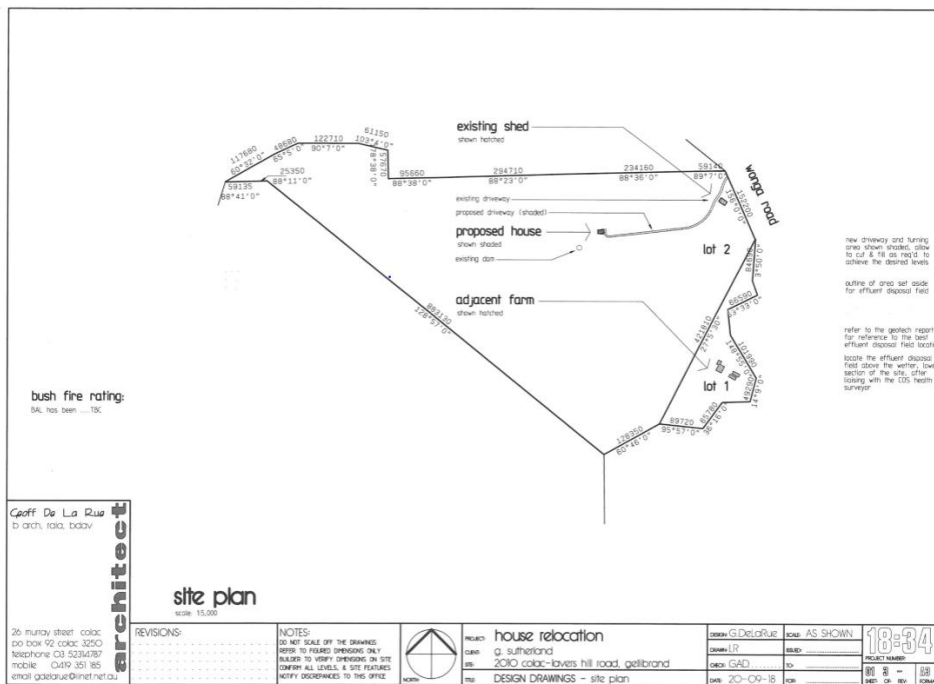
Site features indicating proposed house site location within a large allotment (Source: Geoff De La Rue 2018).
